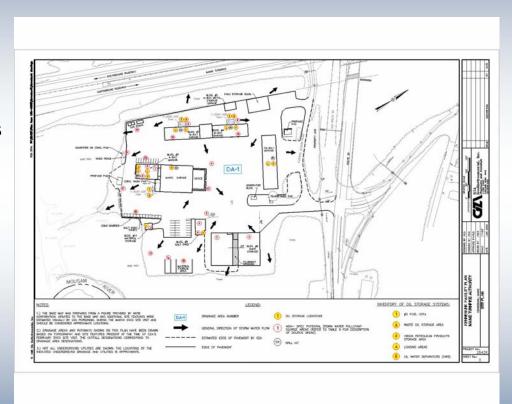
of SPCC Plan: EXTERIOR DRAINAGE FEATURES
